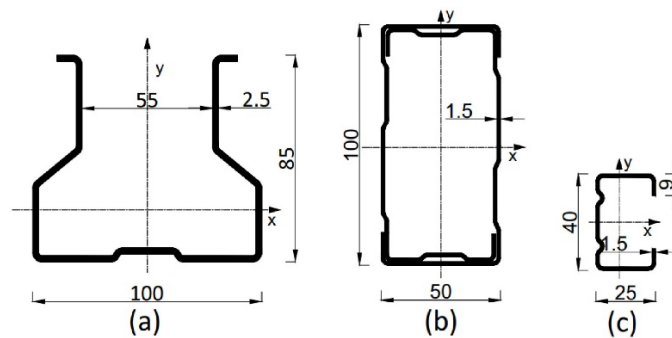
Section details (dimensions in mm): (a) upright, (b) beam, and(c) diagonal brace section.
